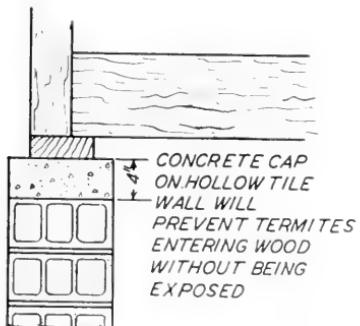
Passage of termites through or between hollow unit masonry foundation into wood sills above may be prevented by capping such a wall with 4 inches of good concrete. The termites may build tubes over this concrete, but, when they do this, their presence is easily detected by thorough inspection.
